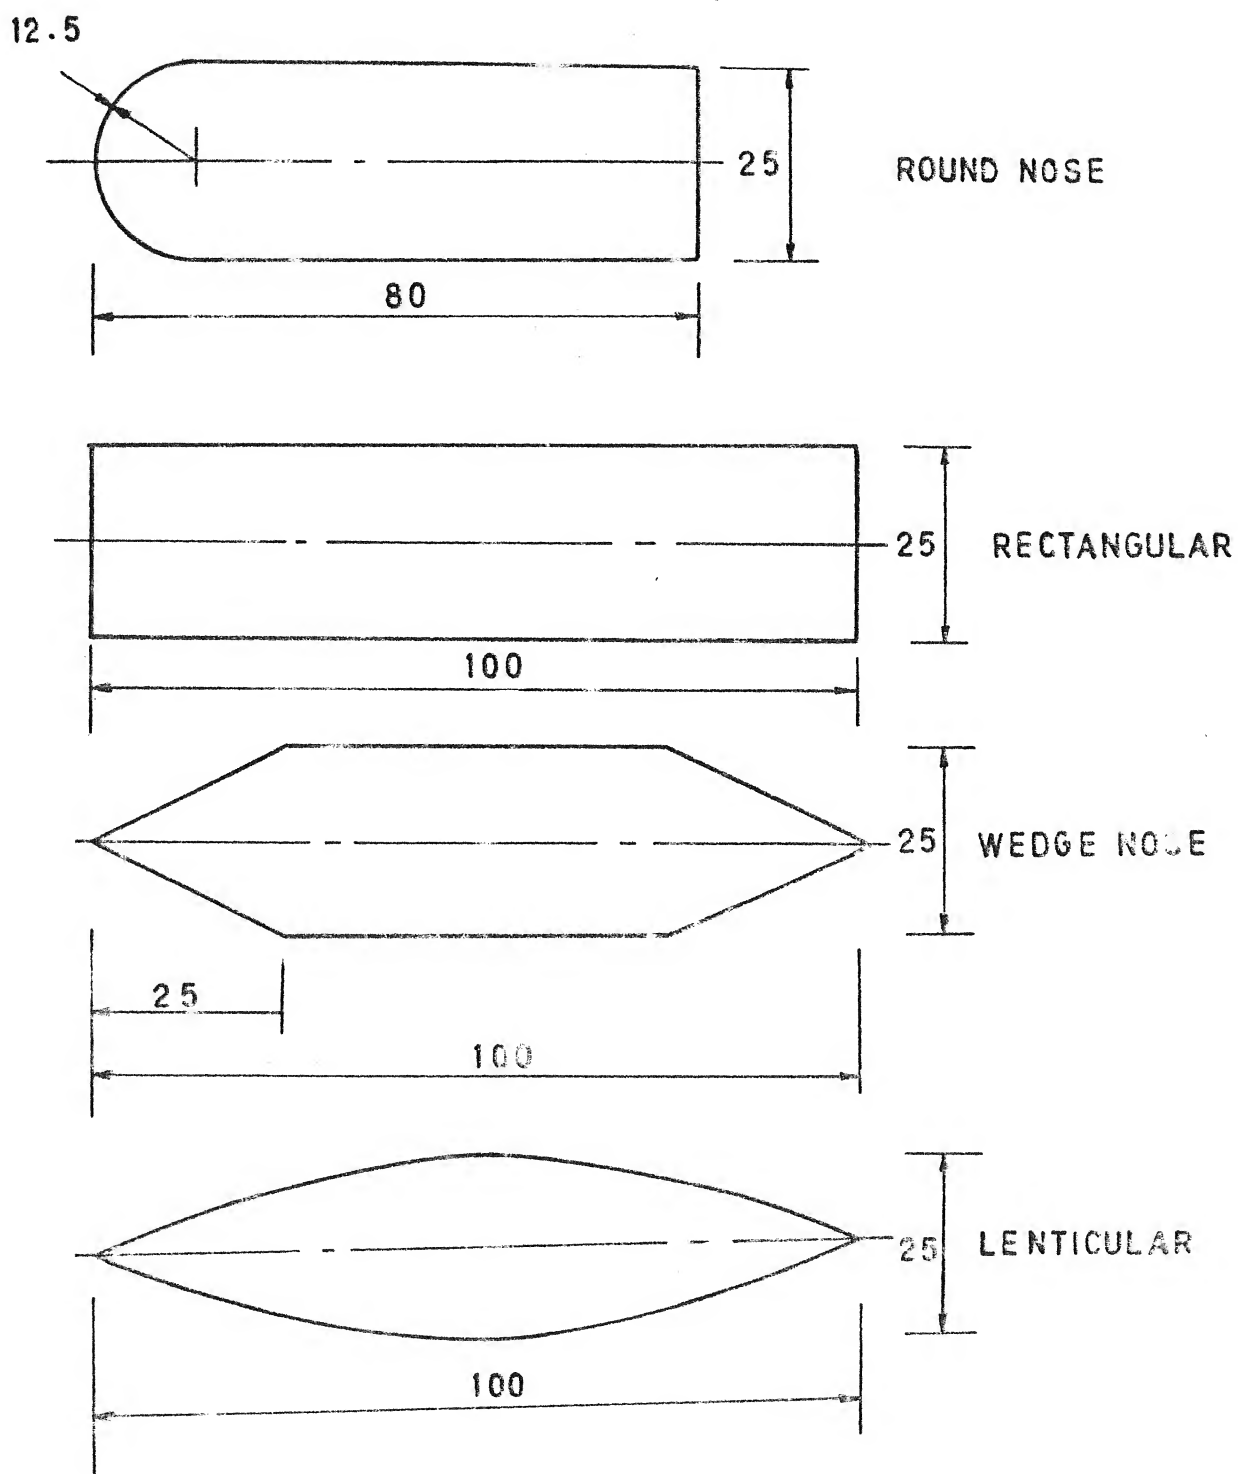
SECTIONAL DETAILS OF PIER MODELS
